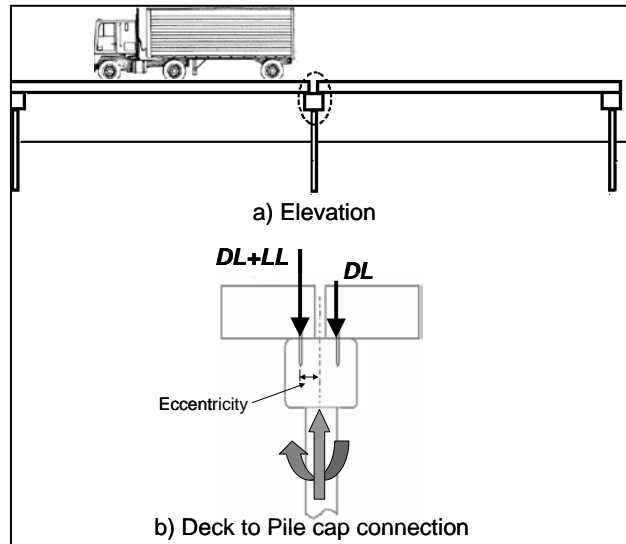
Multiple-span, simply supported bridge on timber piles under eccentric loading.
